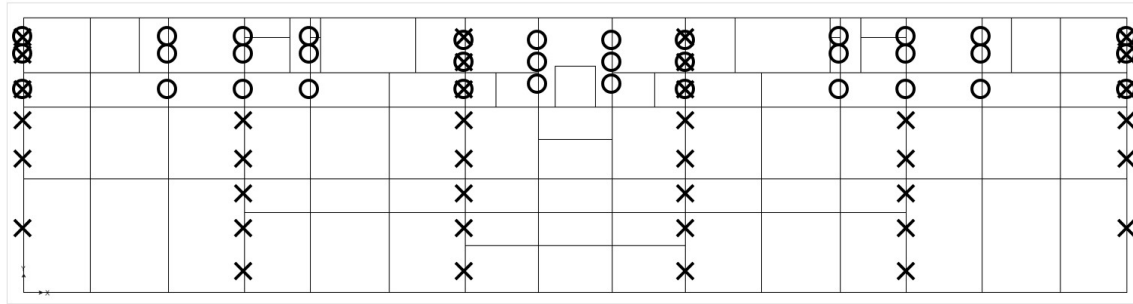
Damper Placement at 3rd floor (SR-Y); MSSSA: 36 dampers;
